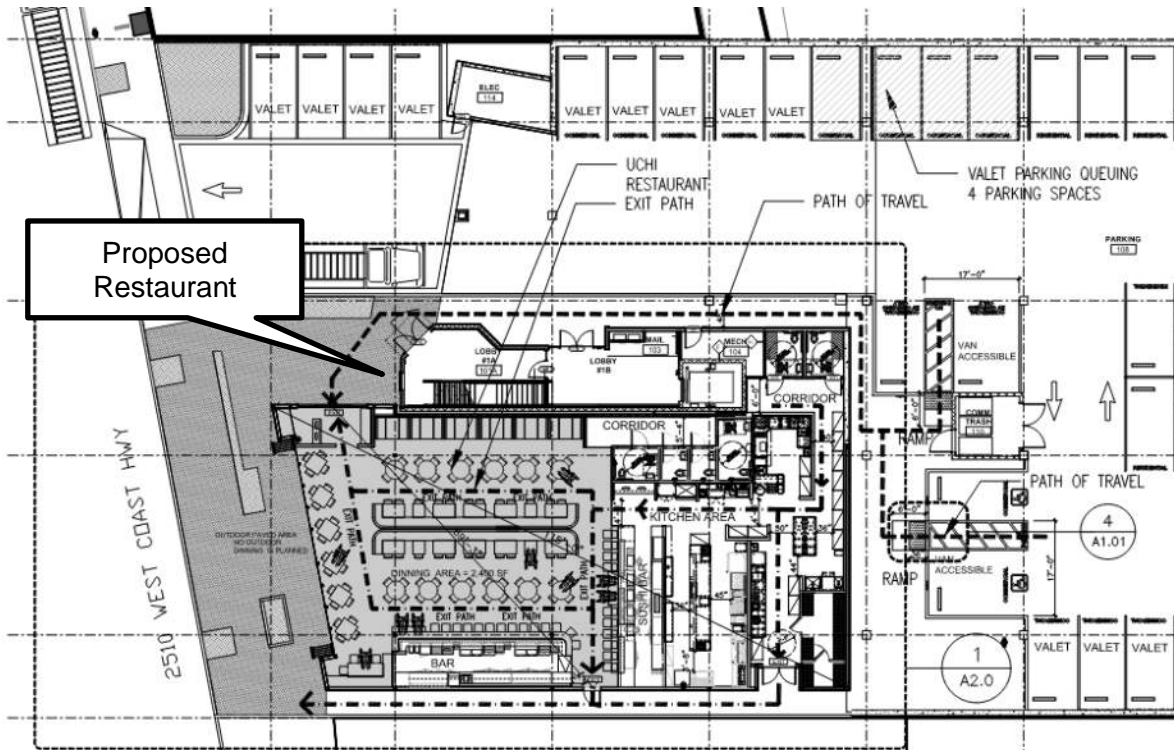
Partial site plan with proposed restaurant and on-site parking spaces.
